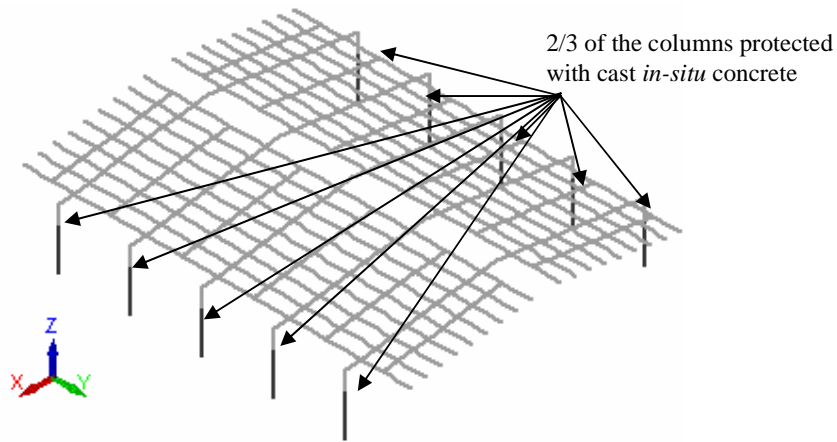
Steel columns protected with cast *in-situ* concrete to two-thirds of the full height
